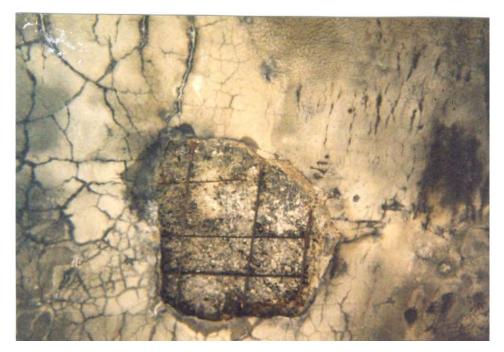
Looking up and west at underside of the west span arch ring. Note: Large spall with deteriorated reinforcing bars and medium to wide cracks in the surrounding concrete. Photo taken prior to repairs in 2000.
